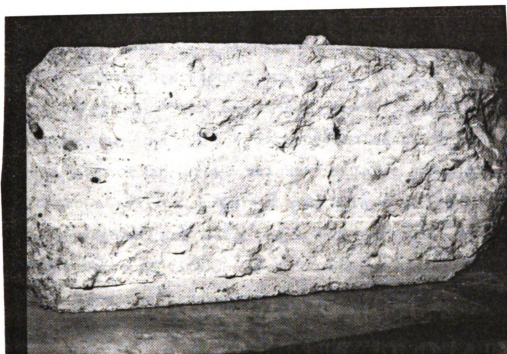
Exposed crack face of 100% recycled gravel concrete specimen after loading
